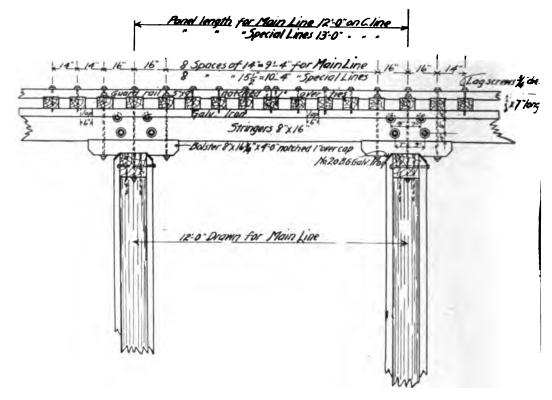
Open Culvert, Louisville and Nashville R. R.
